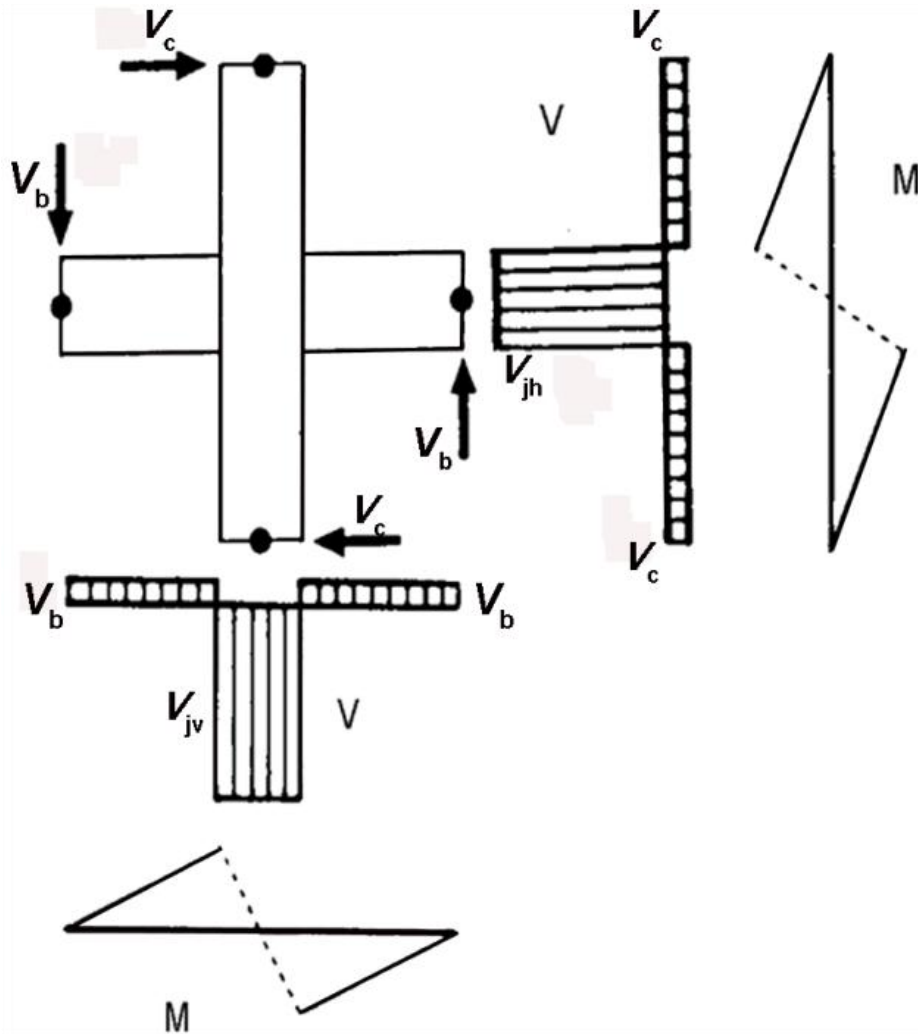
Seismic moments and shears in the beams and columns connected at a joint and seismic shears in the joint core: (a) joint considered as part of the beams; (b) joint considered as part of the column.
